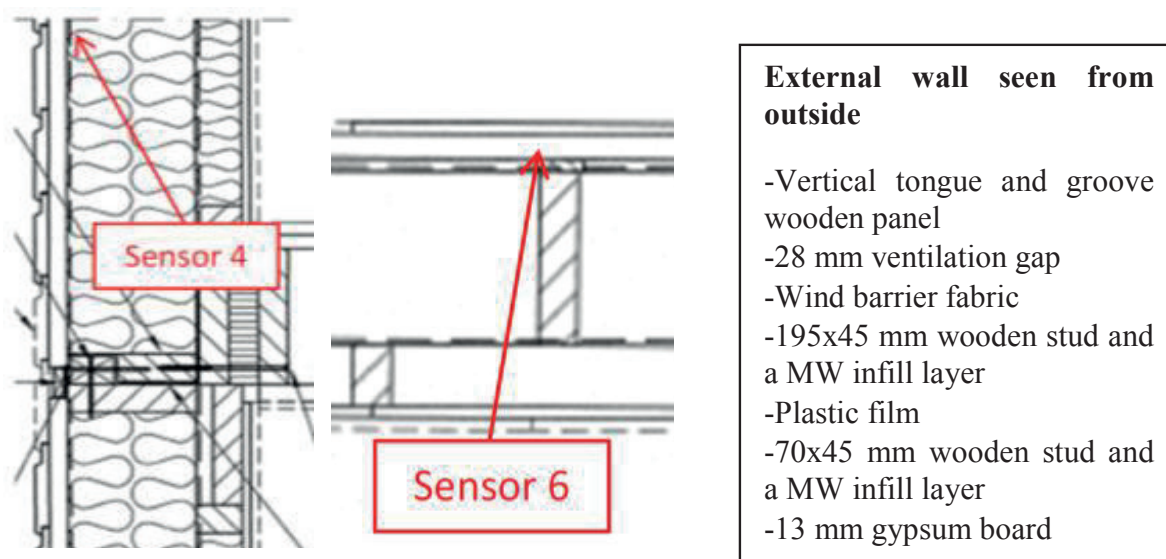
(a) Vertical cross-section of external wall on second floor with placement of sensor 4. (b) Horizontal cross-section of external wall on first floor with placement of sensor 6 in the ventilation gap.
